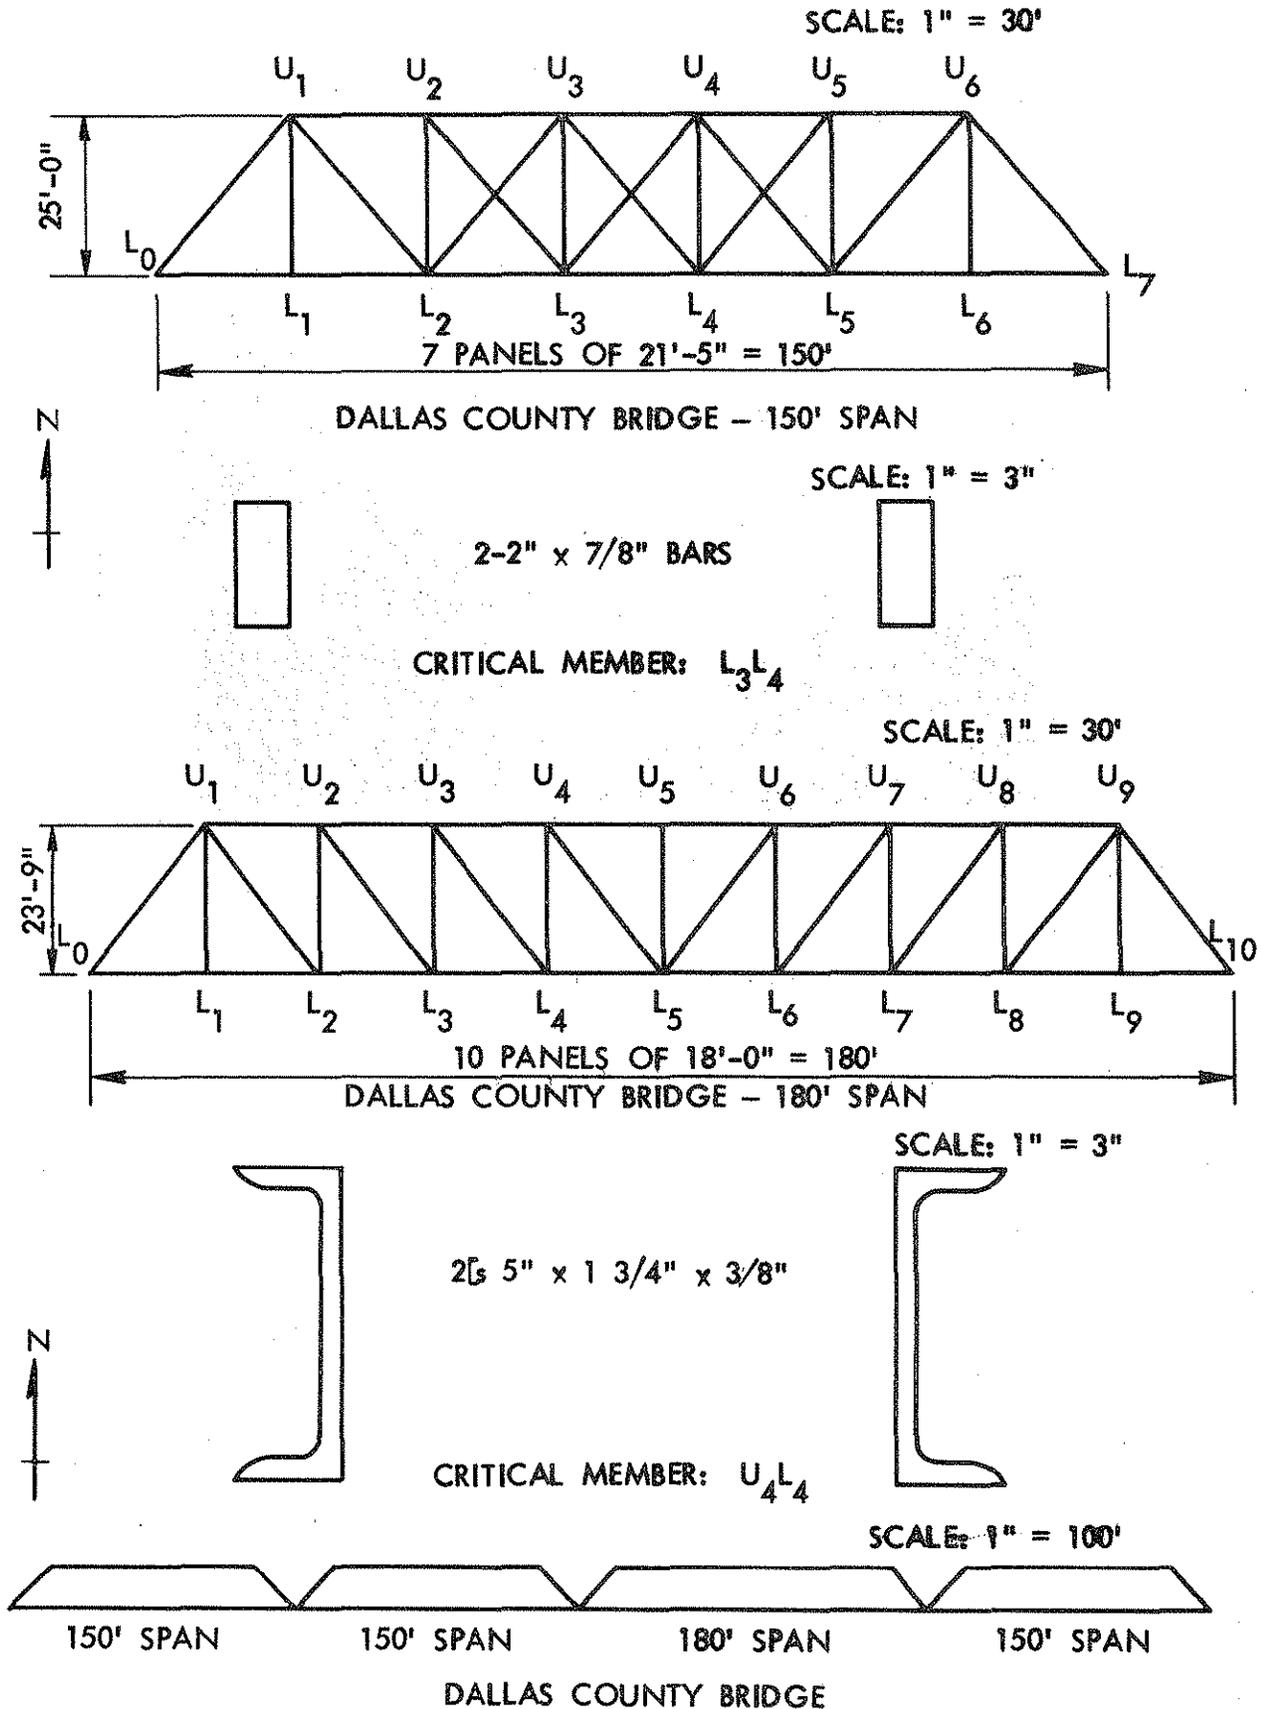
Details of Chestnut Ford Bridge (Dallas County).
